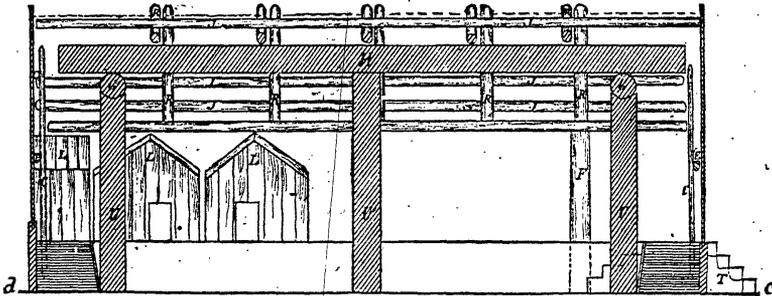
Construction of Kwakiutl house. Longitudinal section, from *c* to *d*.
